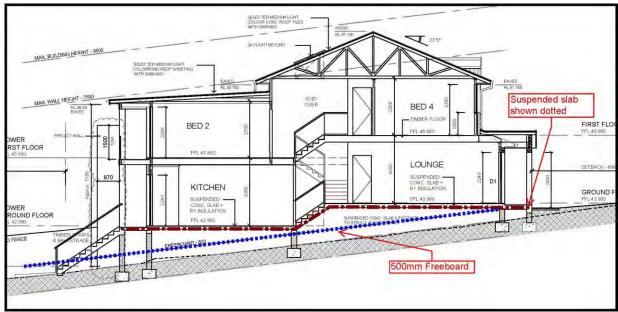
Section showing the proposed dwelling and suspended concrete slab. Also note dwelling respects the existing topography by stepping down the site.
